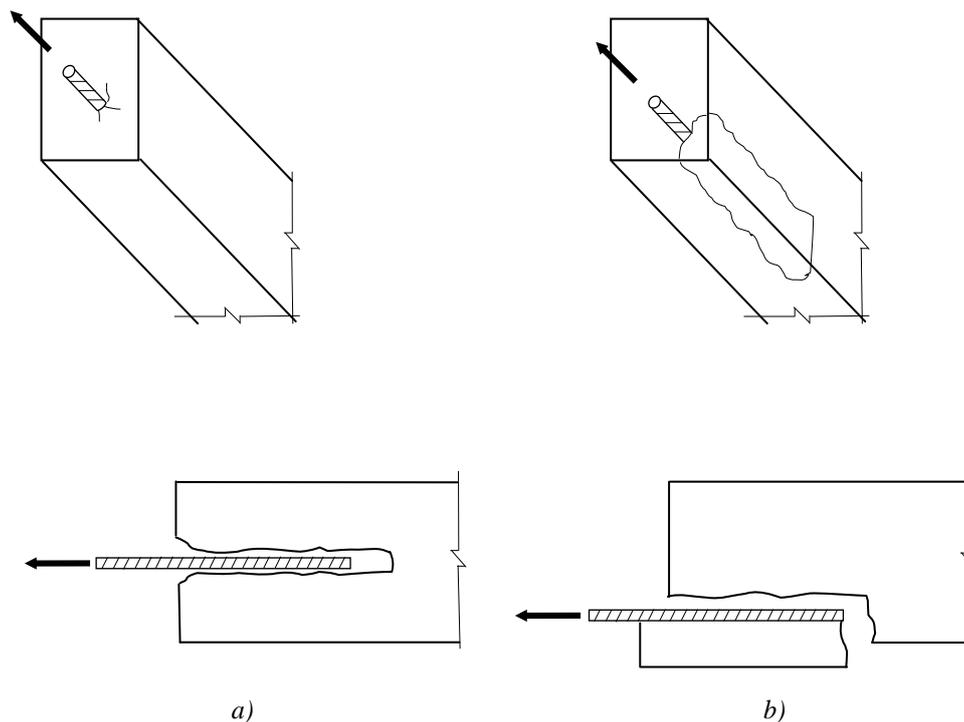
Different types of anchorage failure, a) pullout failure without splitting cracks in the case of large concrete cover, b) splitting failure when the concrete cover is small. The figure is based on Engström (2011a).
